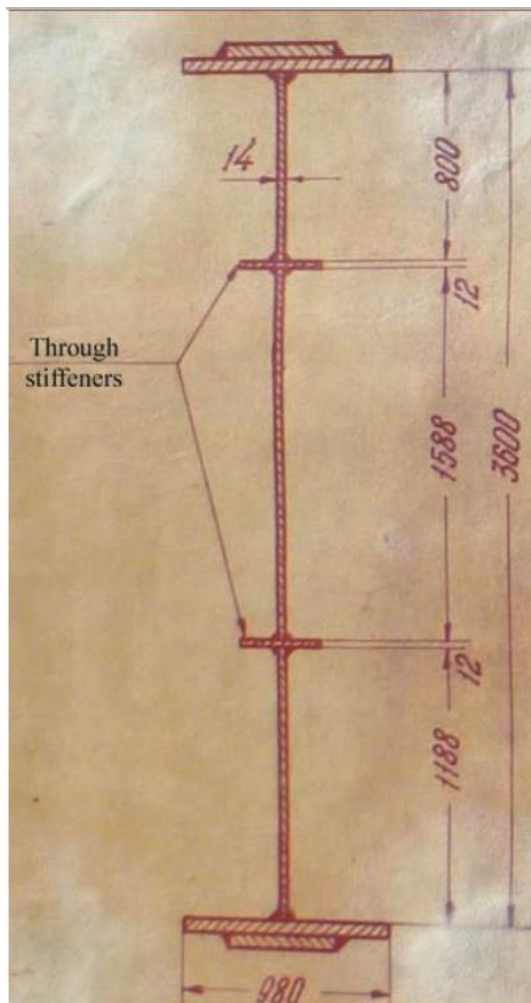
Cross-section of the truss of the main longitudinal beams of four- and five-span structures of the Evgeny Paton Bridge (Poznyakov, Dyadin, Davydov, & Dmytrienko, 2021).
